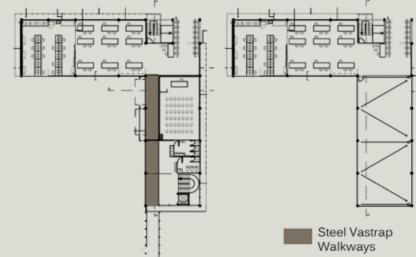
Plans indicating the position of the problematic steel "vastrap" walkways. Plans not to scale. (Stegmann, 2008) edited by (Author, 2012)
